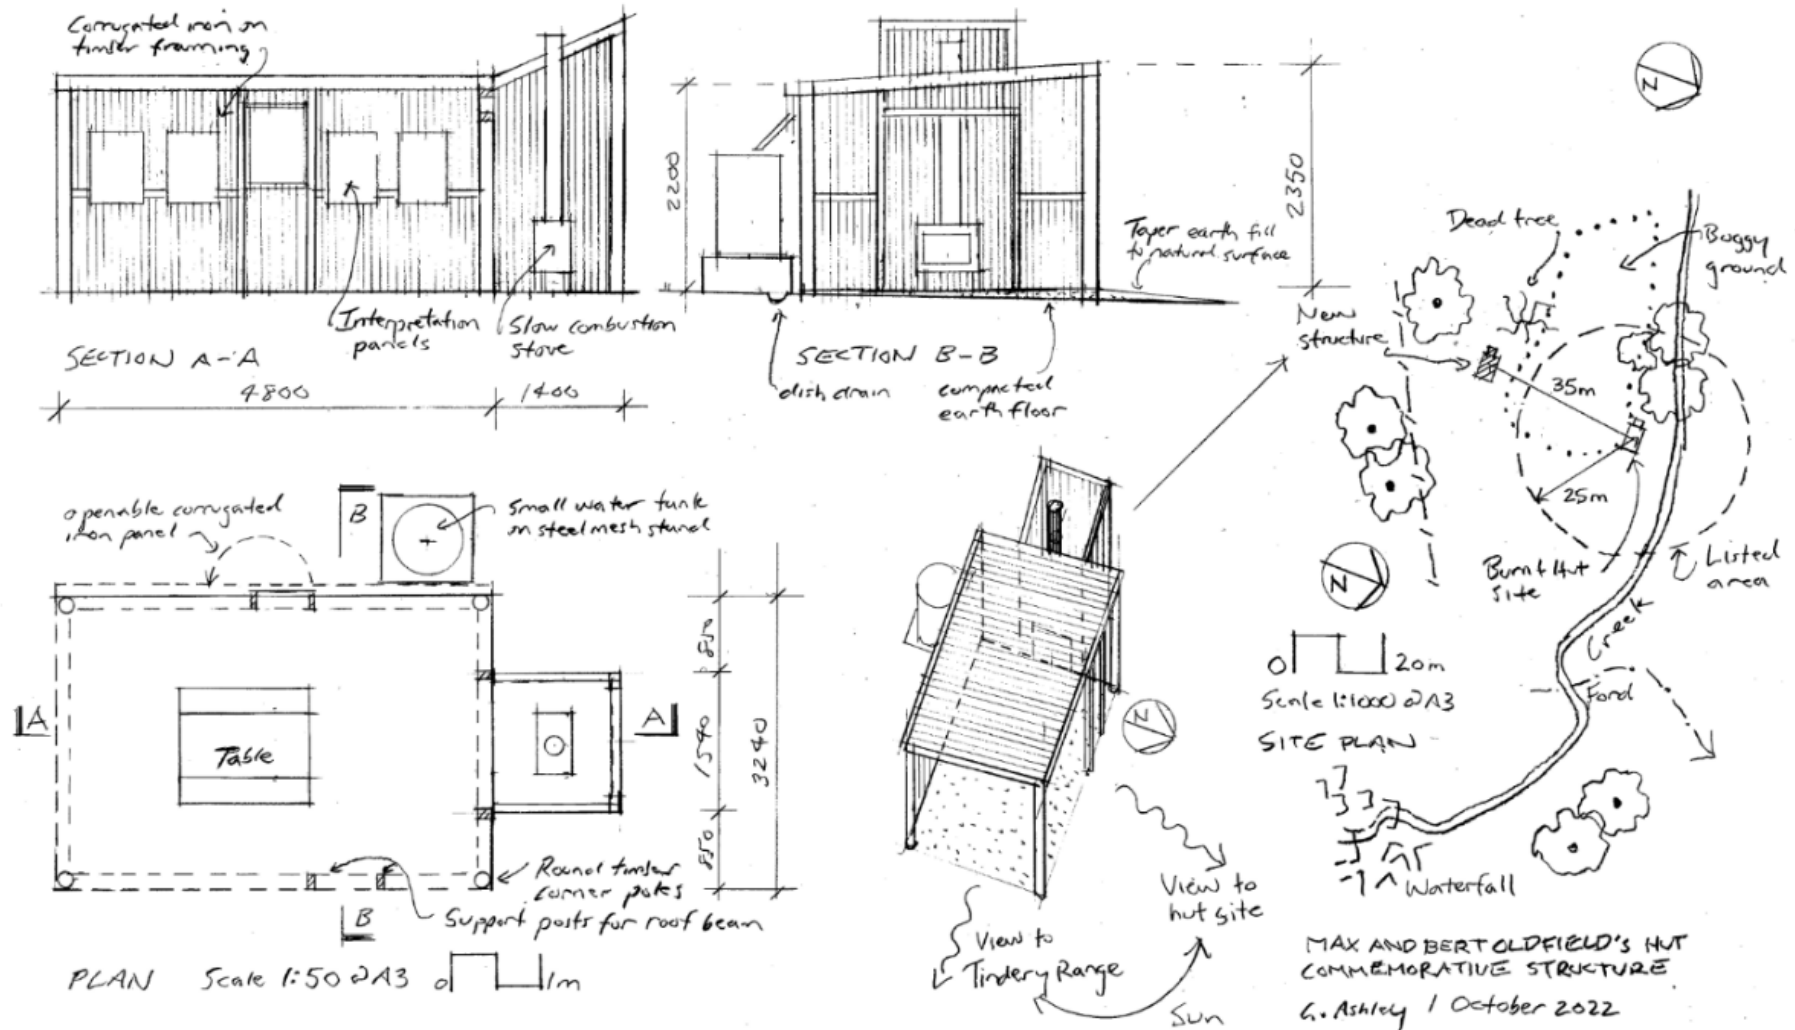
Max and Bert Oldfield's New Structure — site plan showing original hut place and the new structure location and a floor plan and sections. (Source: G Ashley)
